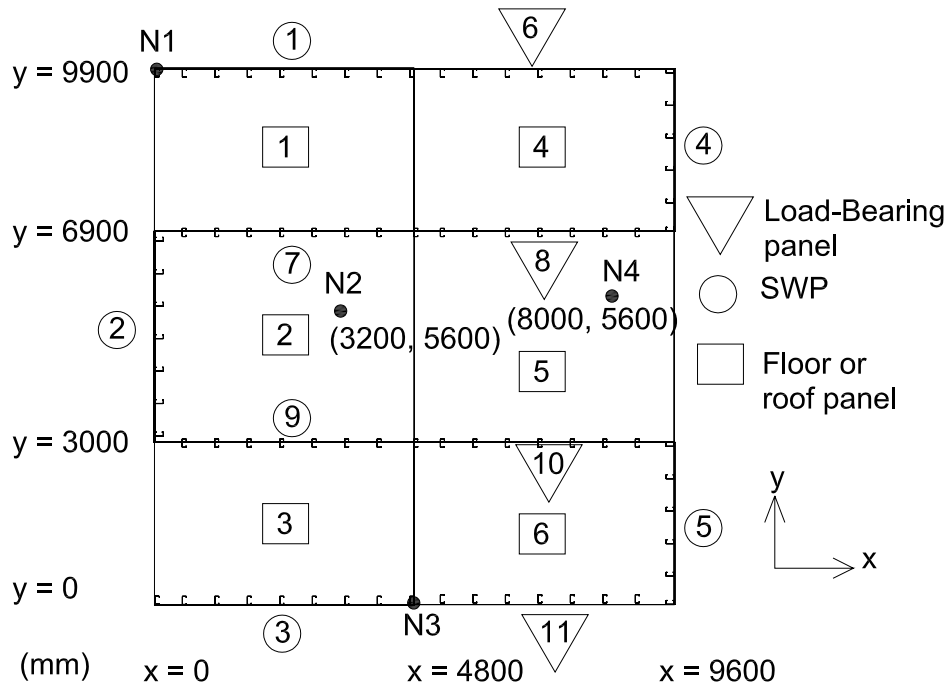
Typical plan and element identification of the three-storey CFS building
